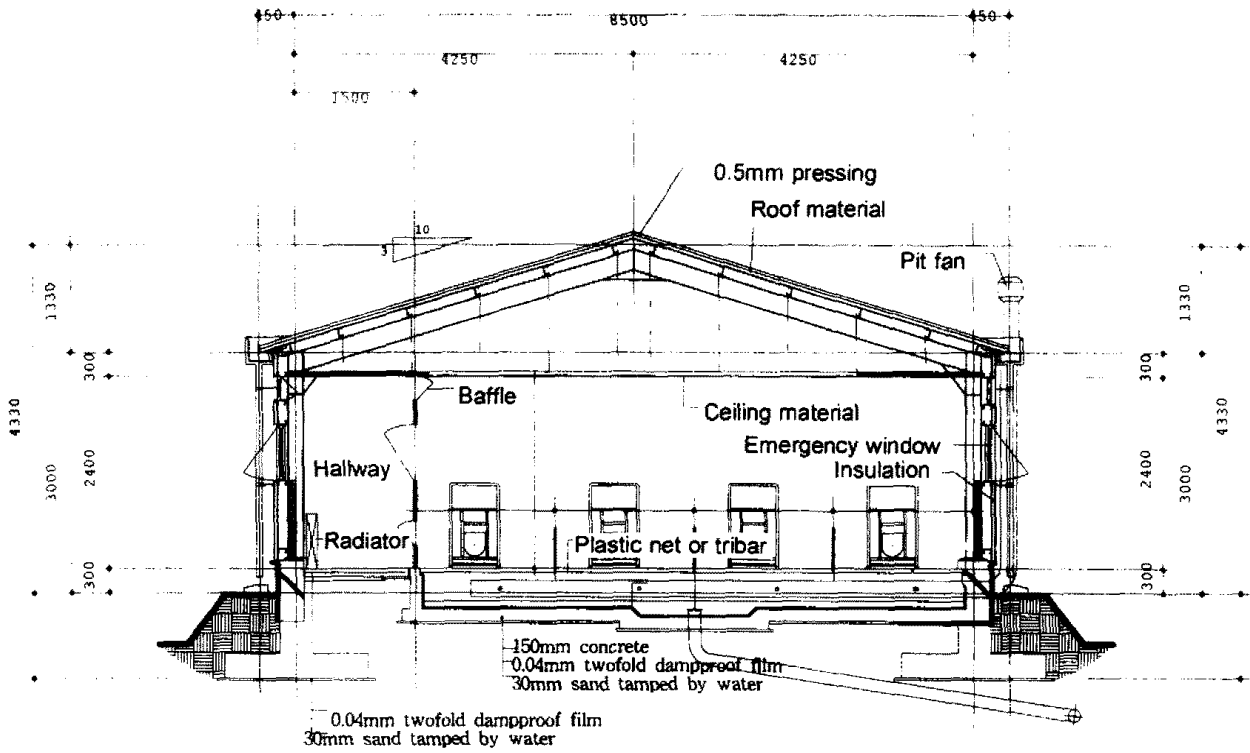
Cross-sectional view of a farrowing building of MODEL- I
